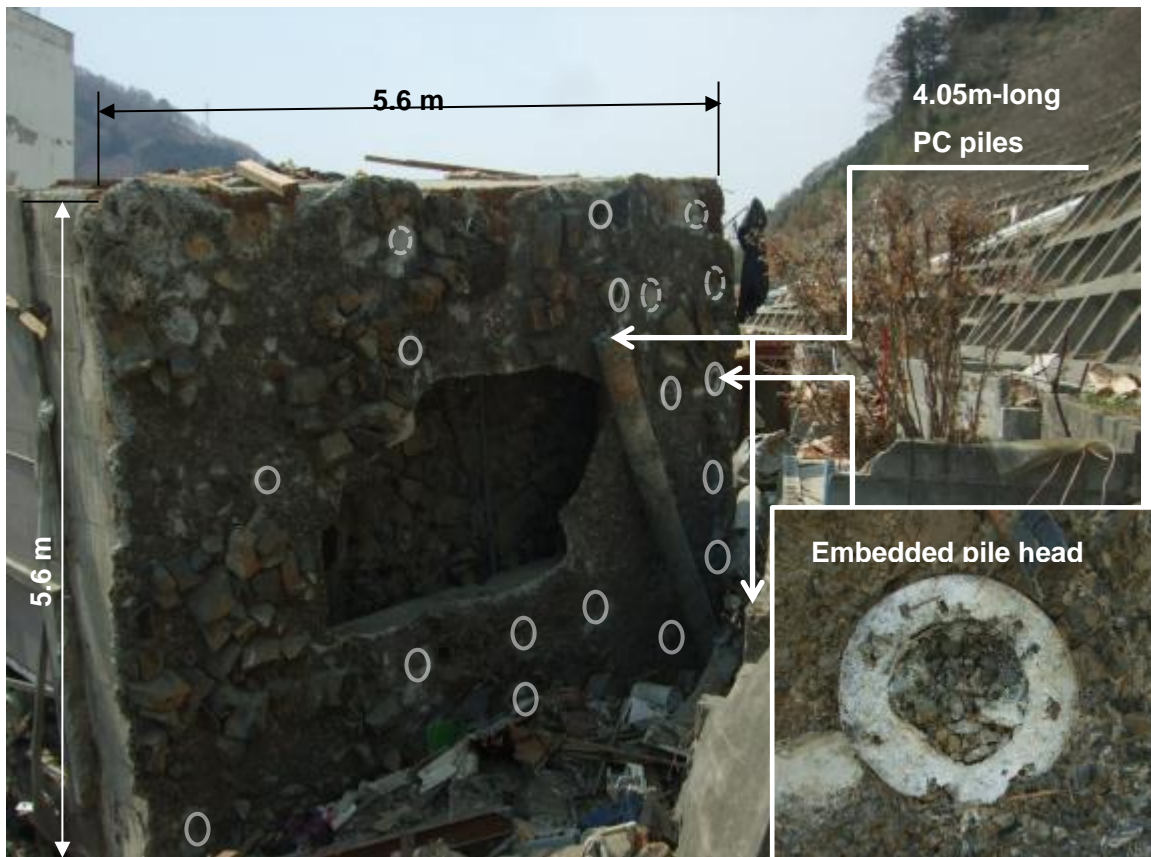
Bottom of foundation for Building #1 and piles left half-embedded in soil
